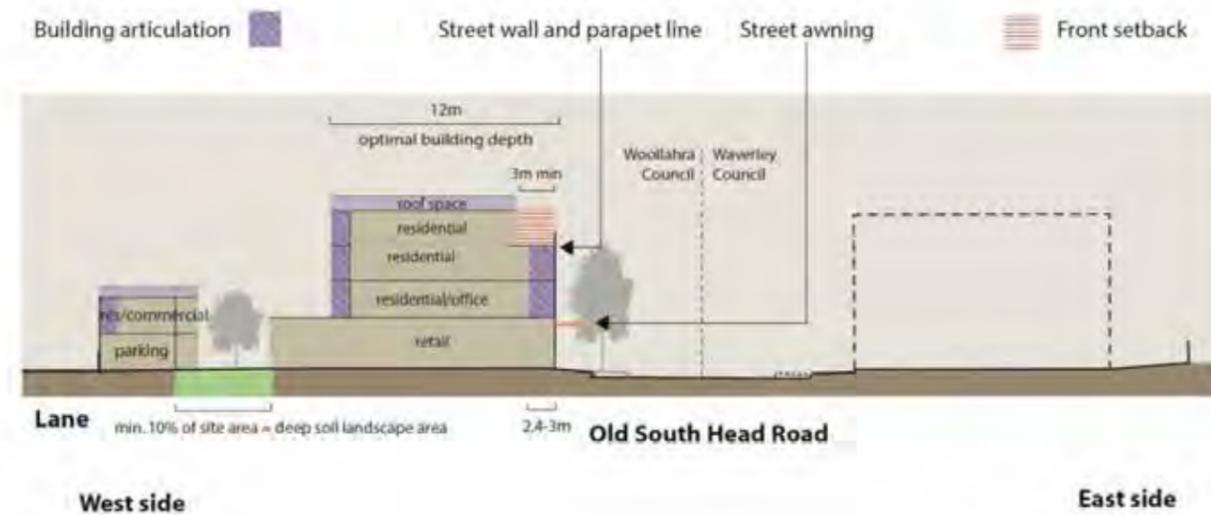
Rose Bay South Section (source: Woollahra DCP 2015)
